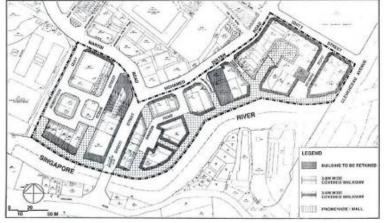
Robertson Quay typical section of building envelope and covered walkway plan. Reprinted from Urban Redevelopment Authority. *Envelope Control Plan: Robertson Quay*, (Singapore, 1994)
